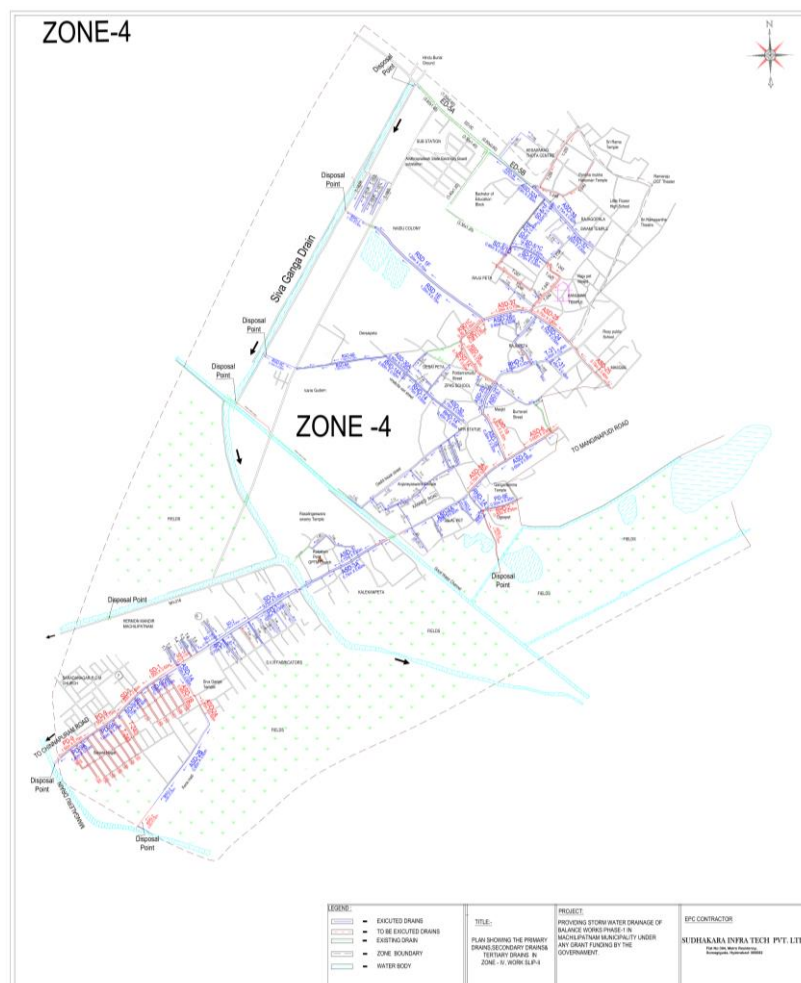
Storm Water Drainage Plan for Basin 4 (Source: Municipal Corporation, 2025)
